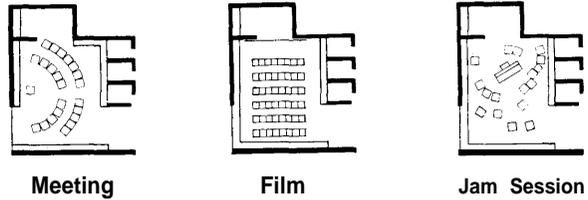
Enclosed Multipurpose Space Alternative Use Plans
